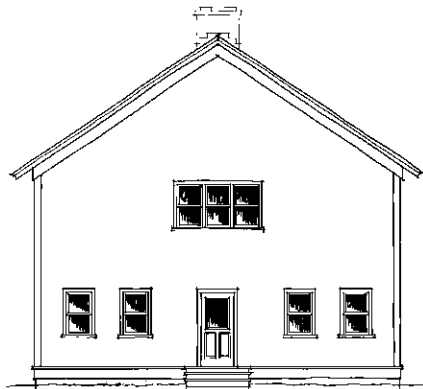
A two-story plan is a fine way to enclose a maximum amount of space at minimal cost, but without skillful detailing, the gable end often presents an awkward, top-heavy look (above). Lowering the roofline is a simple way to provide a better-proportioned facade, although it complicates the framing and interior finish. Shed dormers can be added if additional space is needed upstairs (right).
